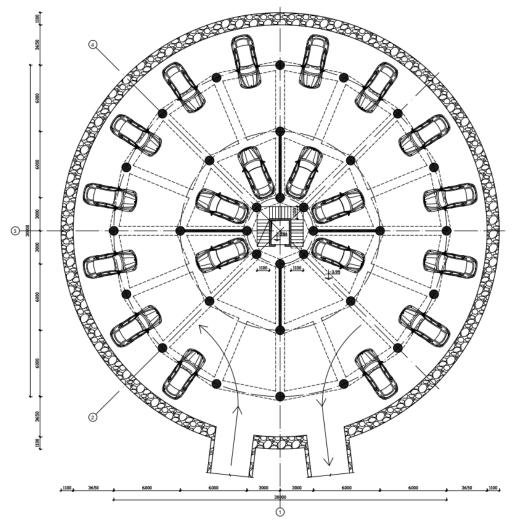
Plan of location of the strip foundation beams, columns and shear walls in the basement (parking) floor at the mark -3.95
